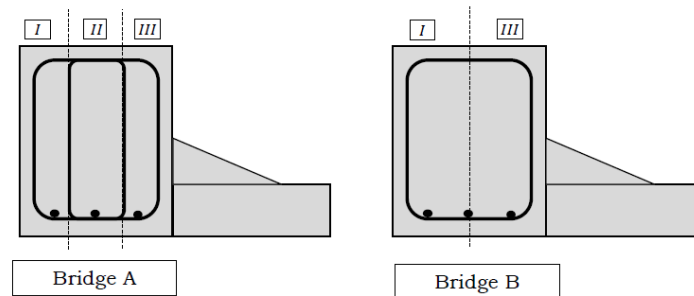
Shear reinforcement zones for bridge A (left) and bridge B (right)
